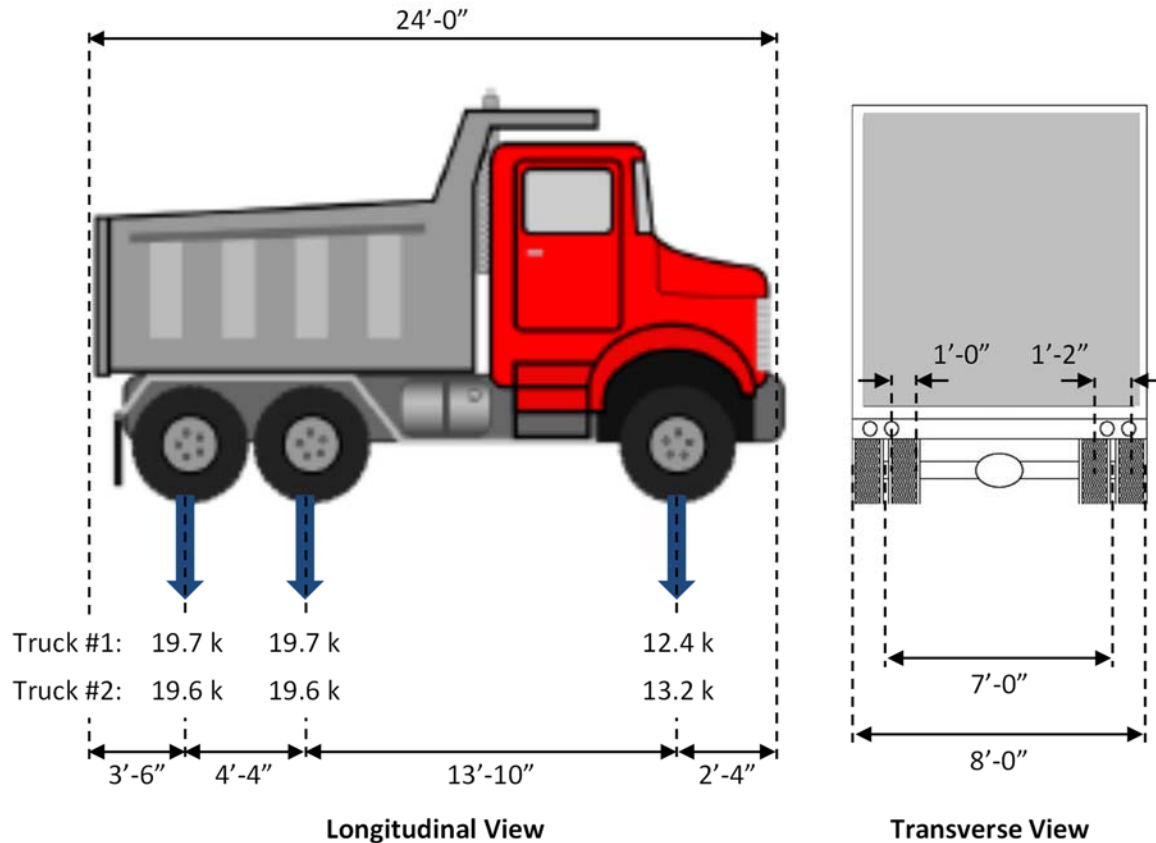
Dimensions and Axle Weights of Trucks Used in Load Test
